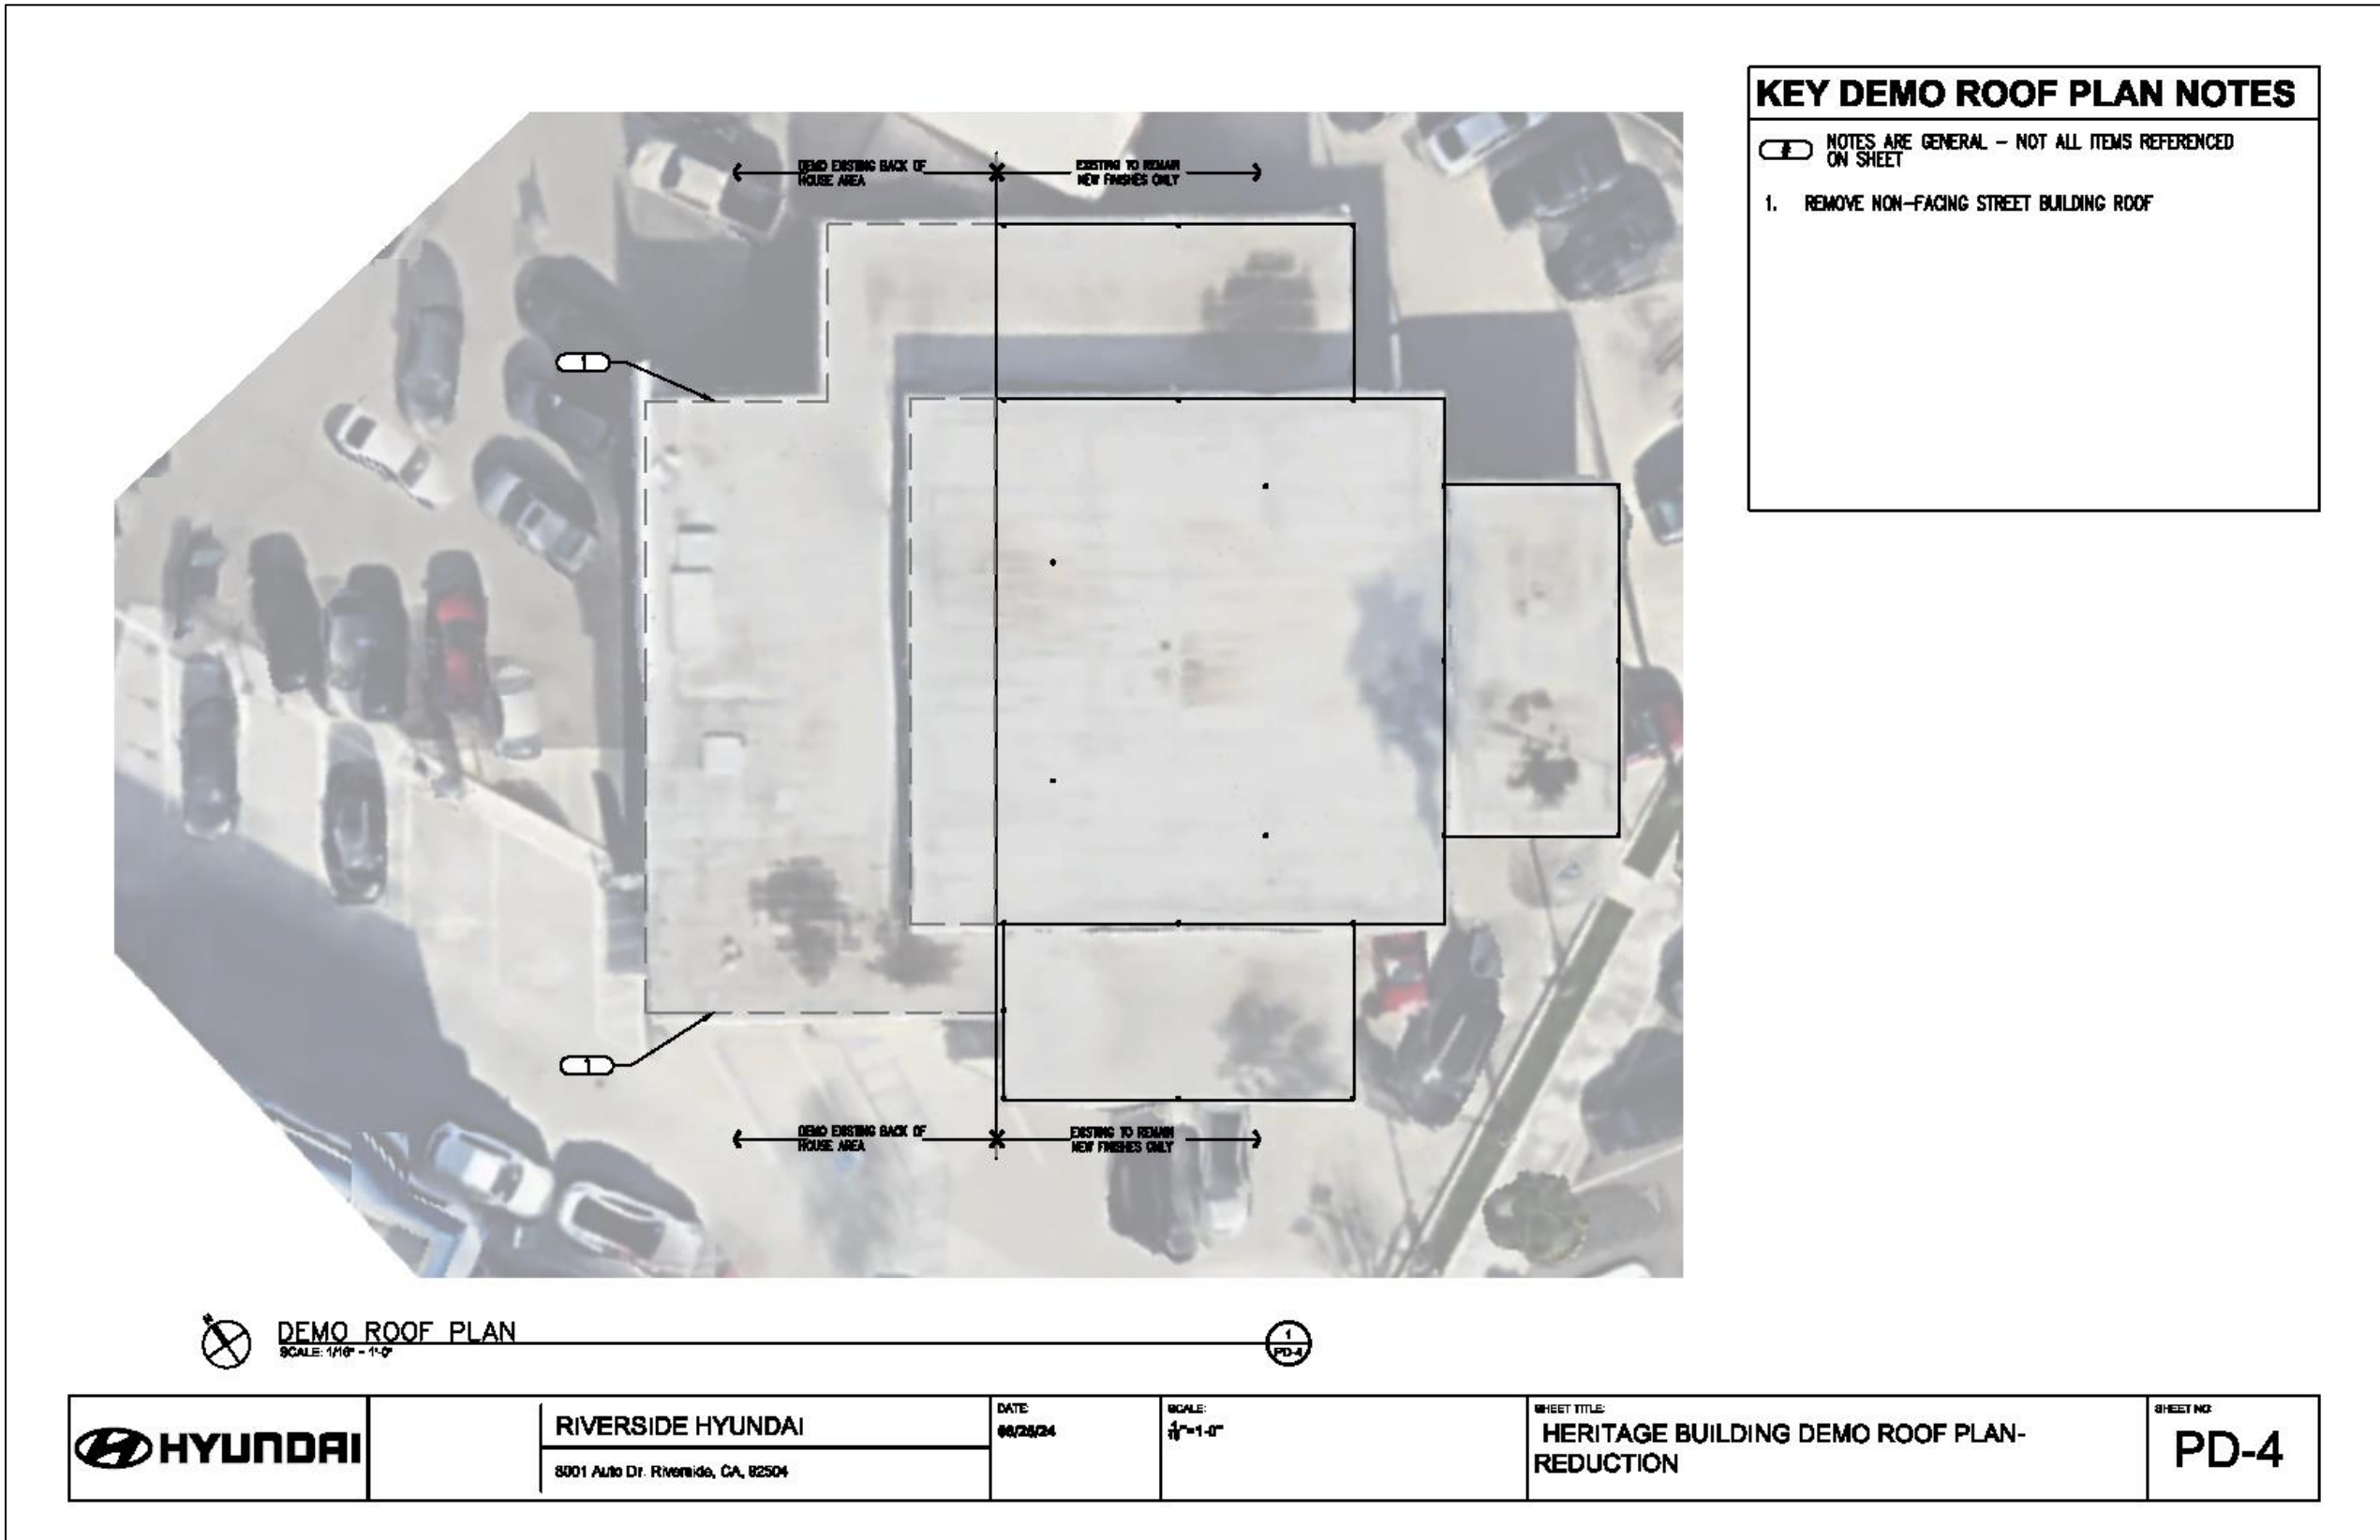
Floor plan with aerial view of the proposed Project (Provided by Mike Khoury).
